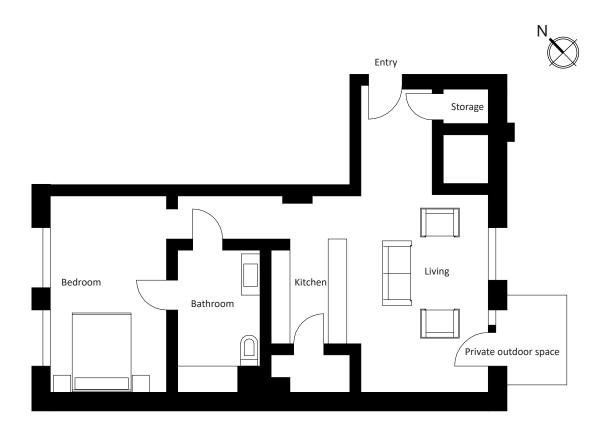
Floor plan of housing unit in Main East Side Lofts (scale 1:100)
